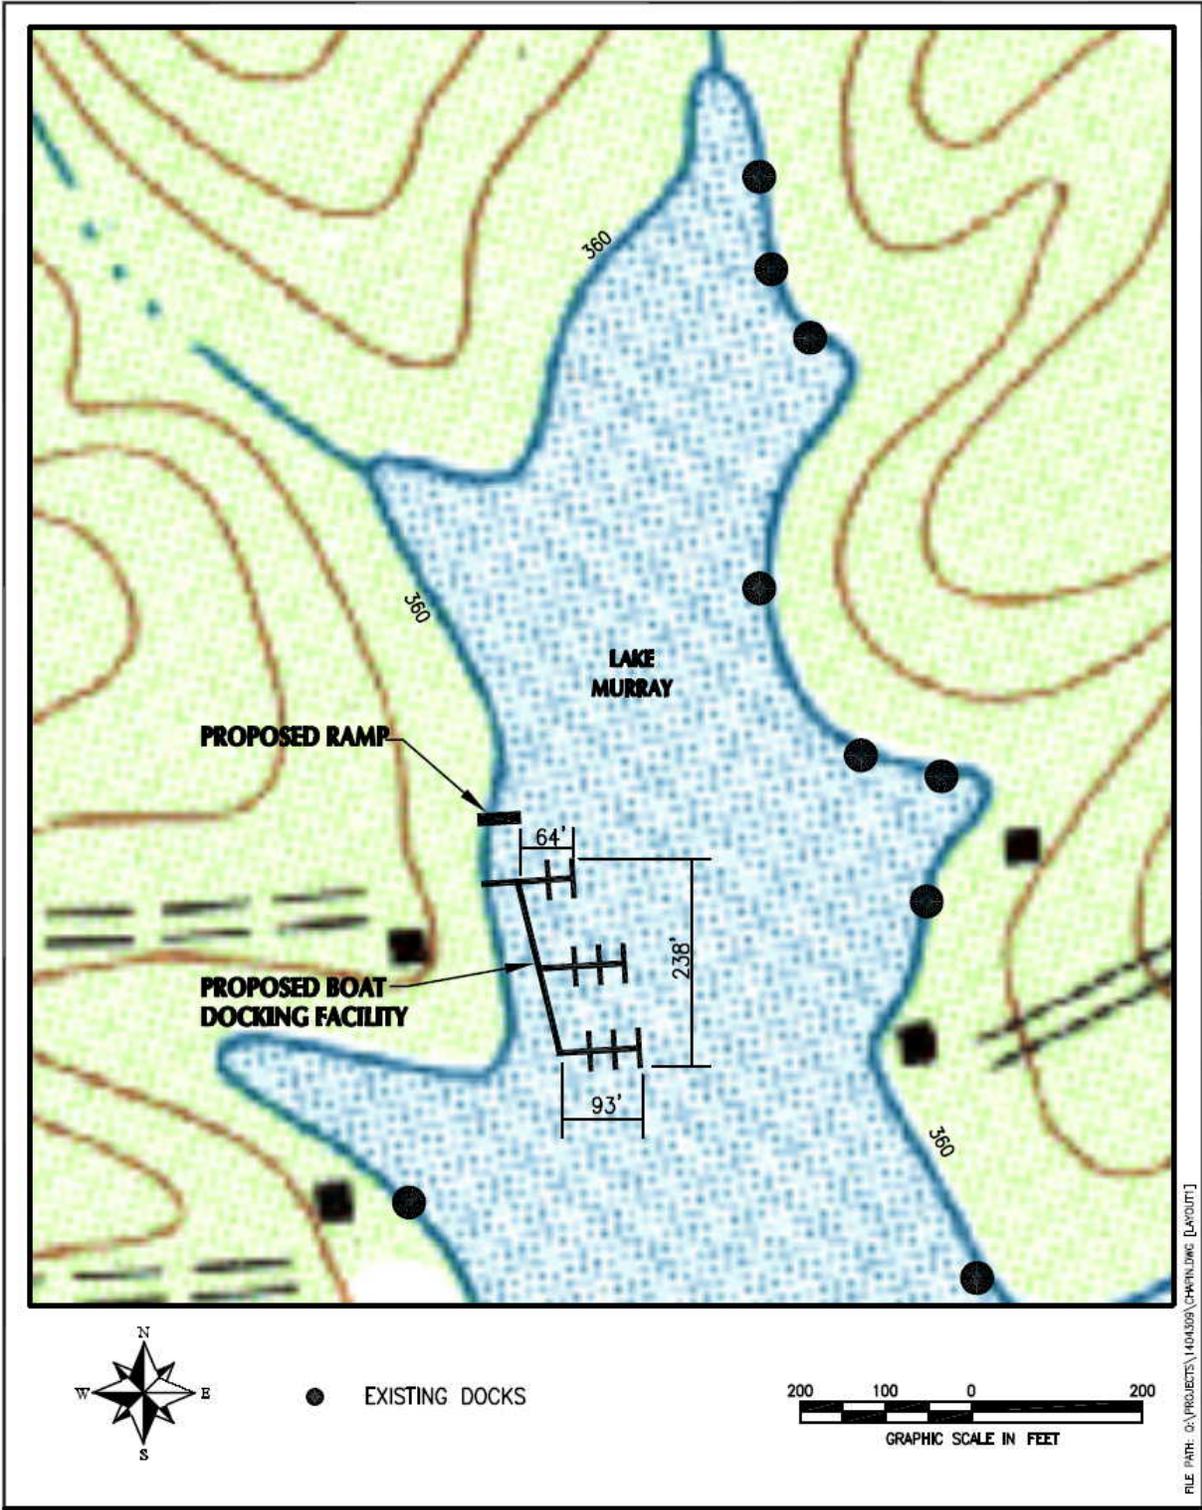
Site Plans For Lakeside at Ballentine's Proposed Boat Ramp And Docking Facility
